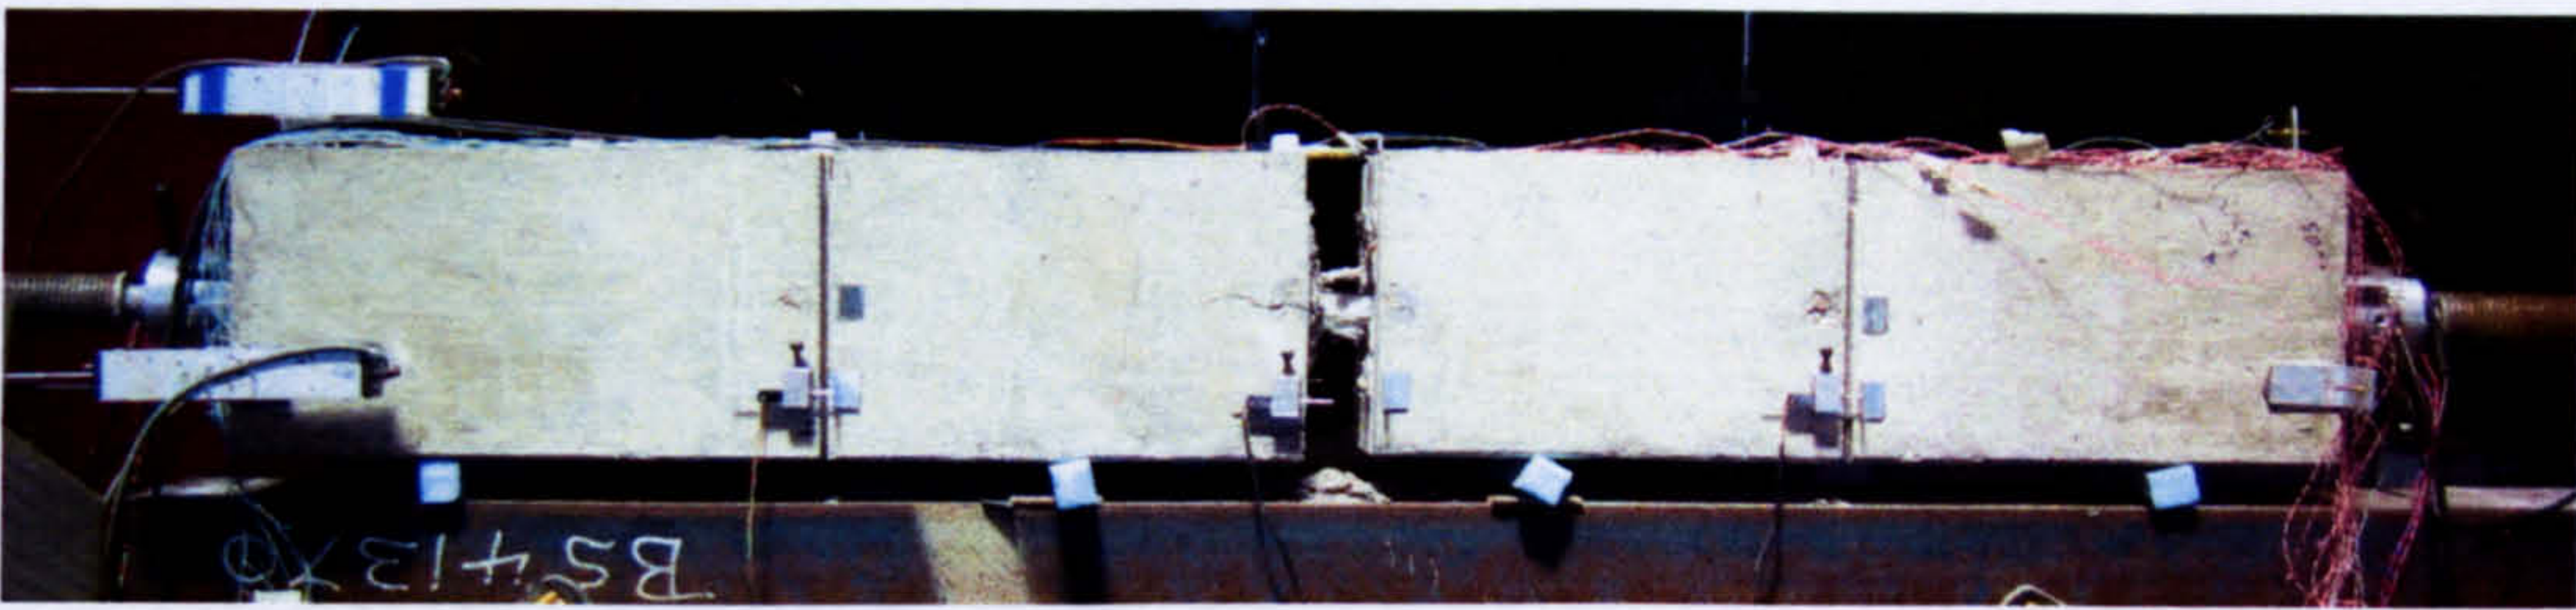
15 View of the notched specimen after bar failure in the middle crack
